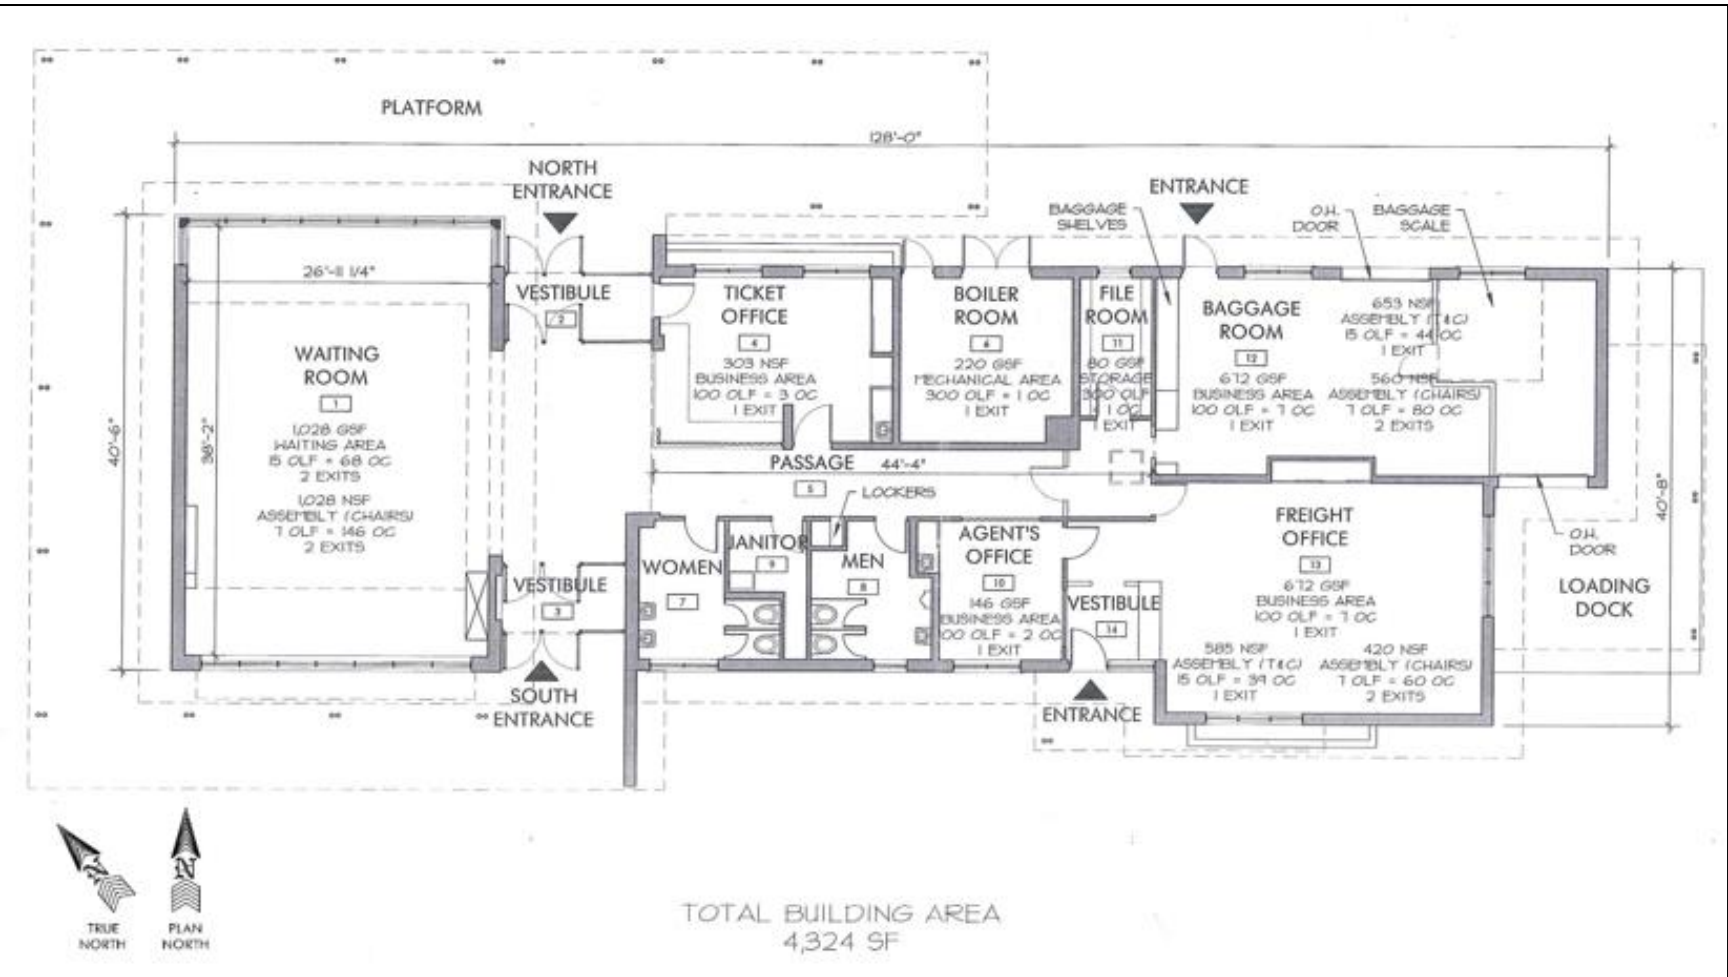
(Plan): Floor plan prepared in 2009 by Herlly Associates
